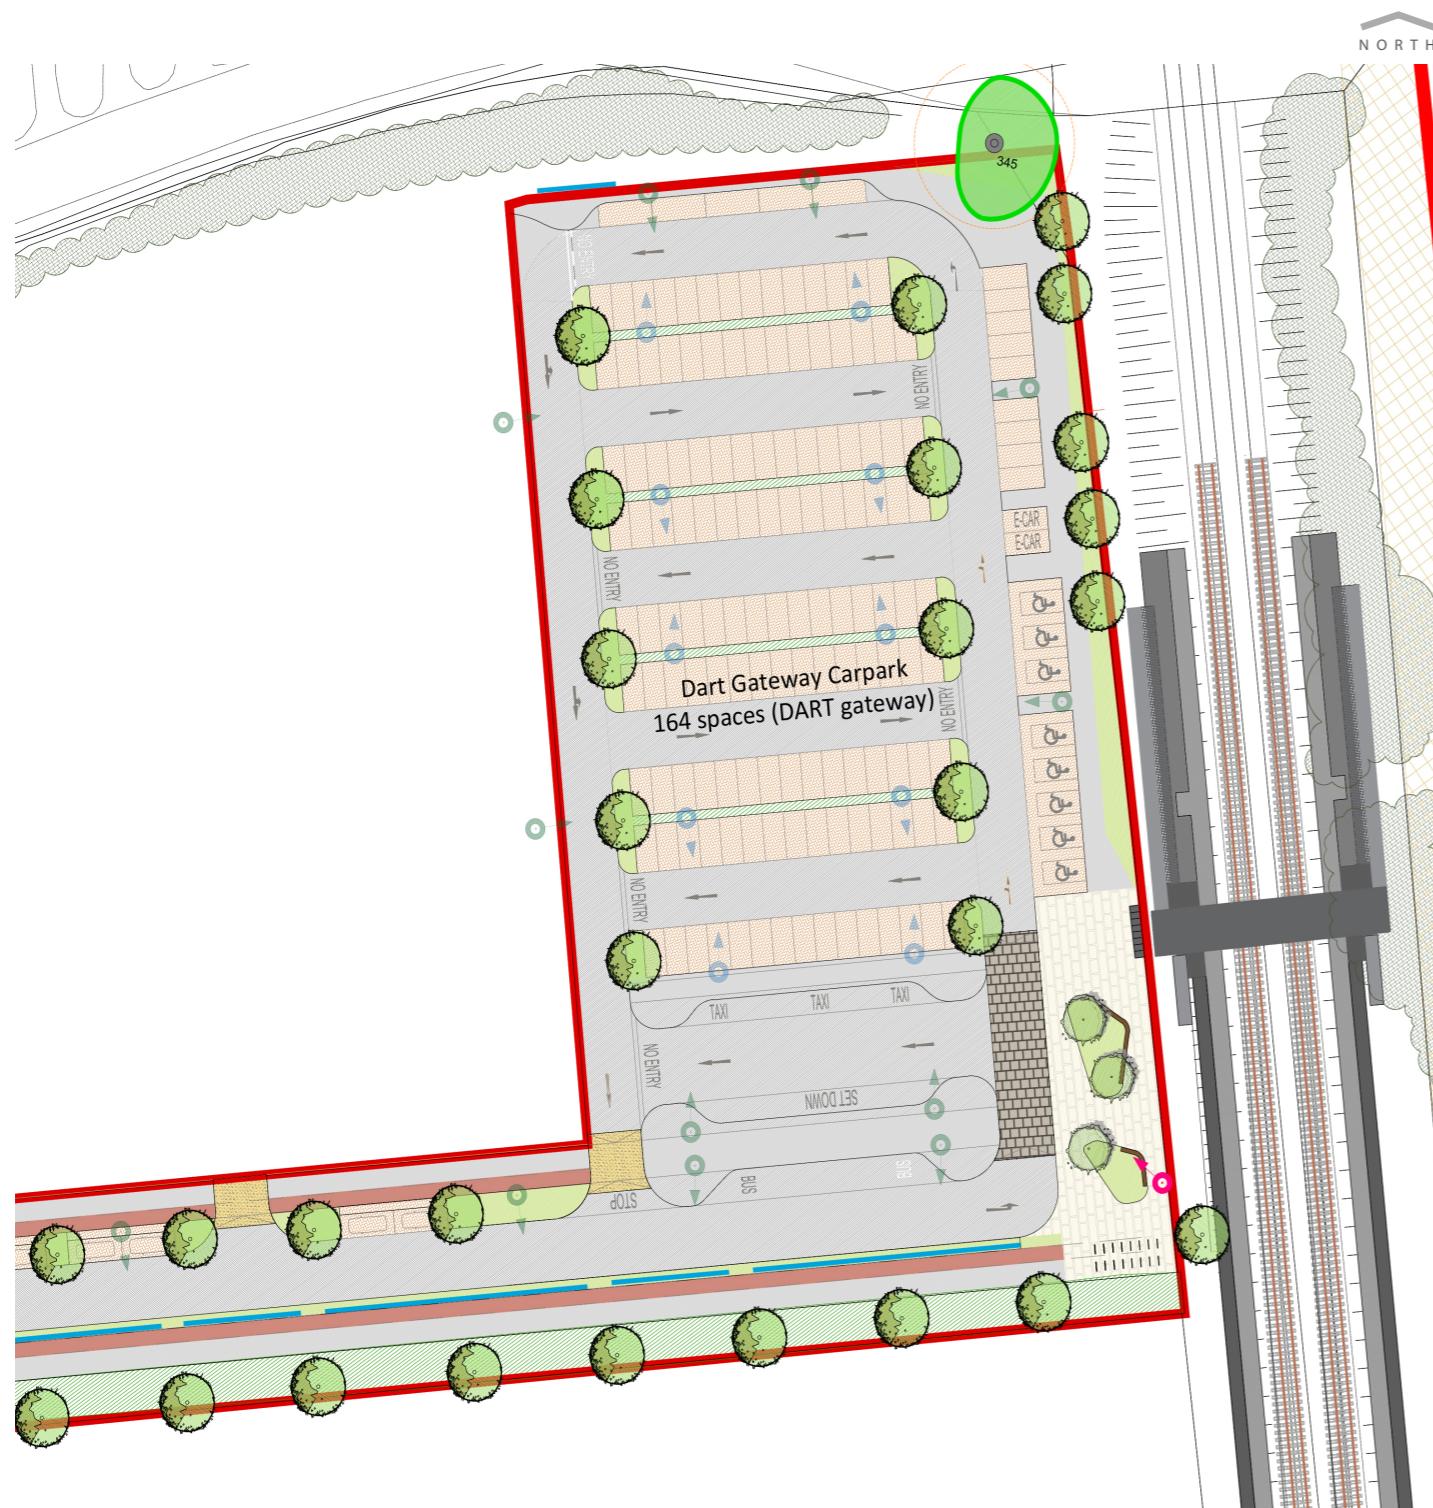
Overall Plan of Civic Space and Temporary Car Park to Woodbrook Station
